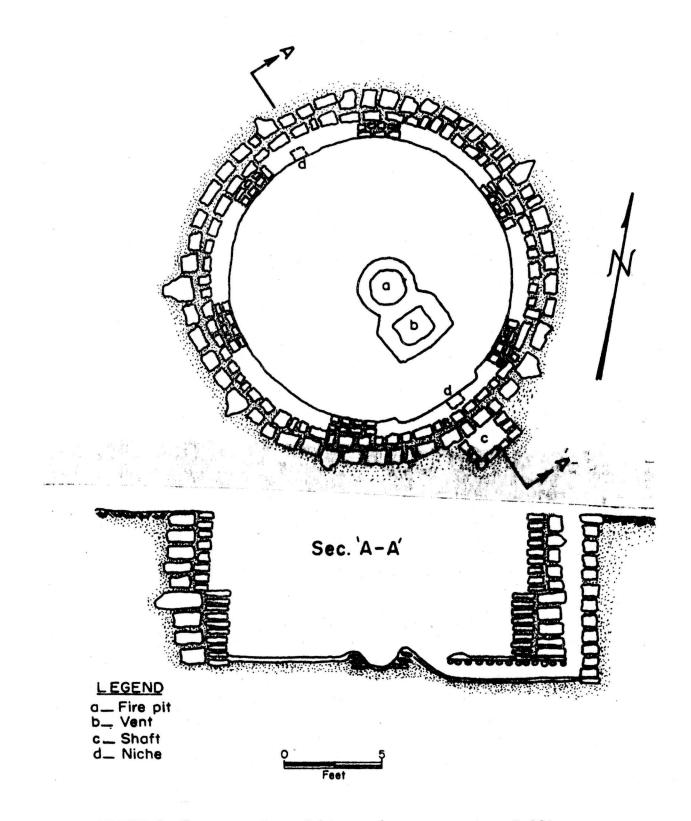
Top view plan of kiva and cross section, Bc236.
